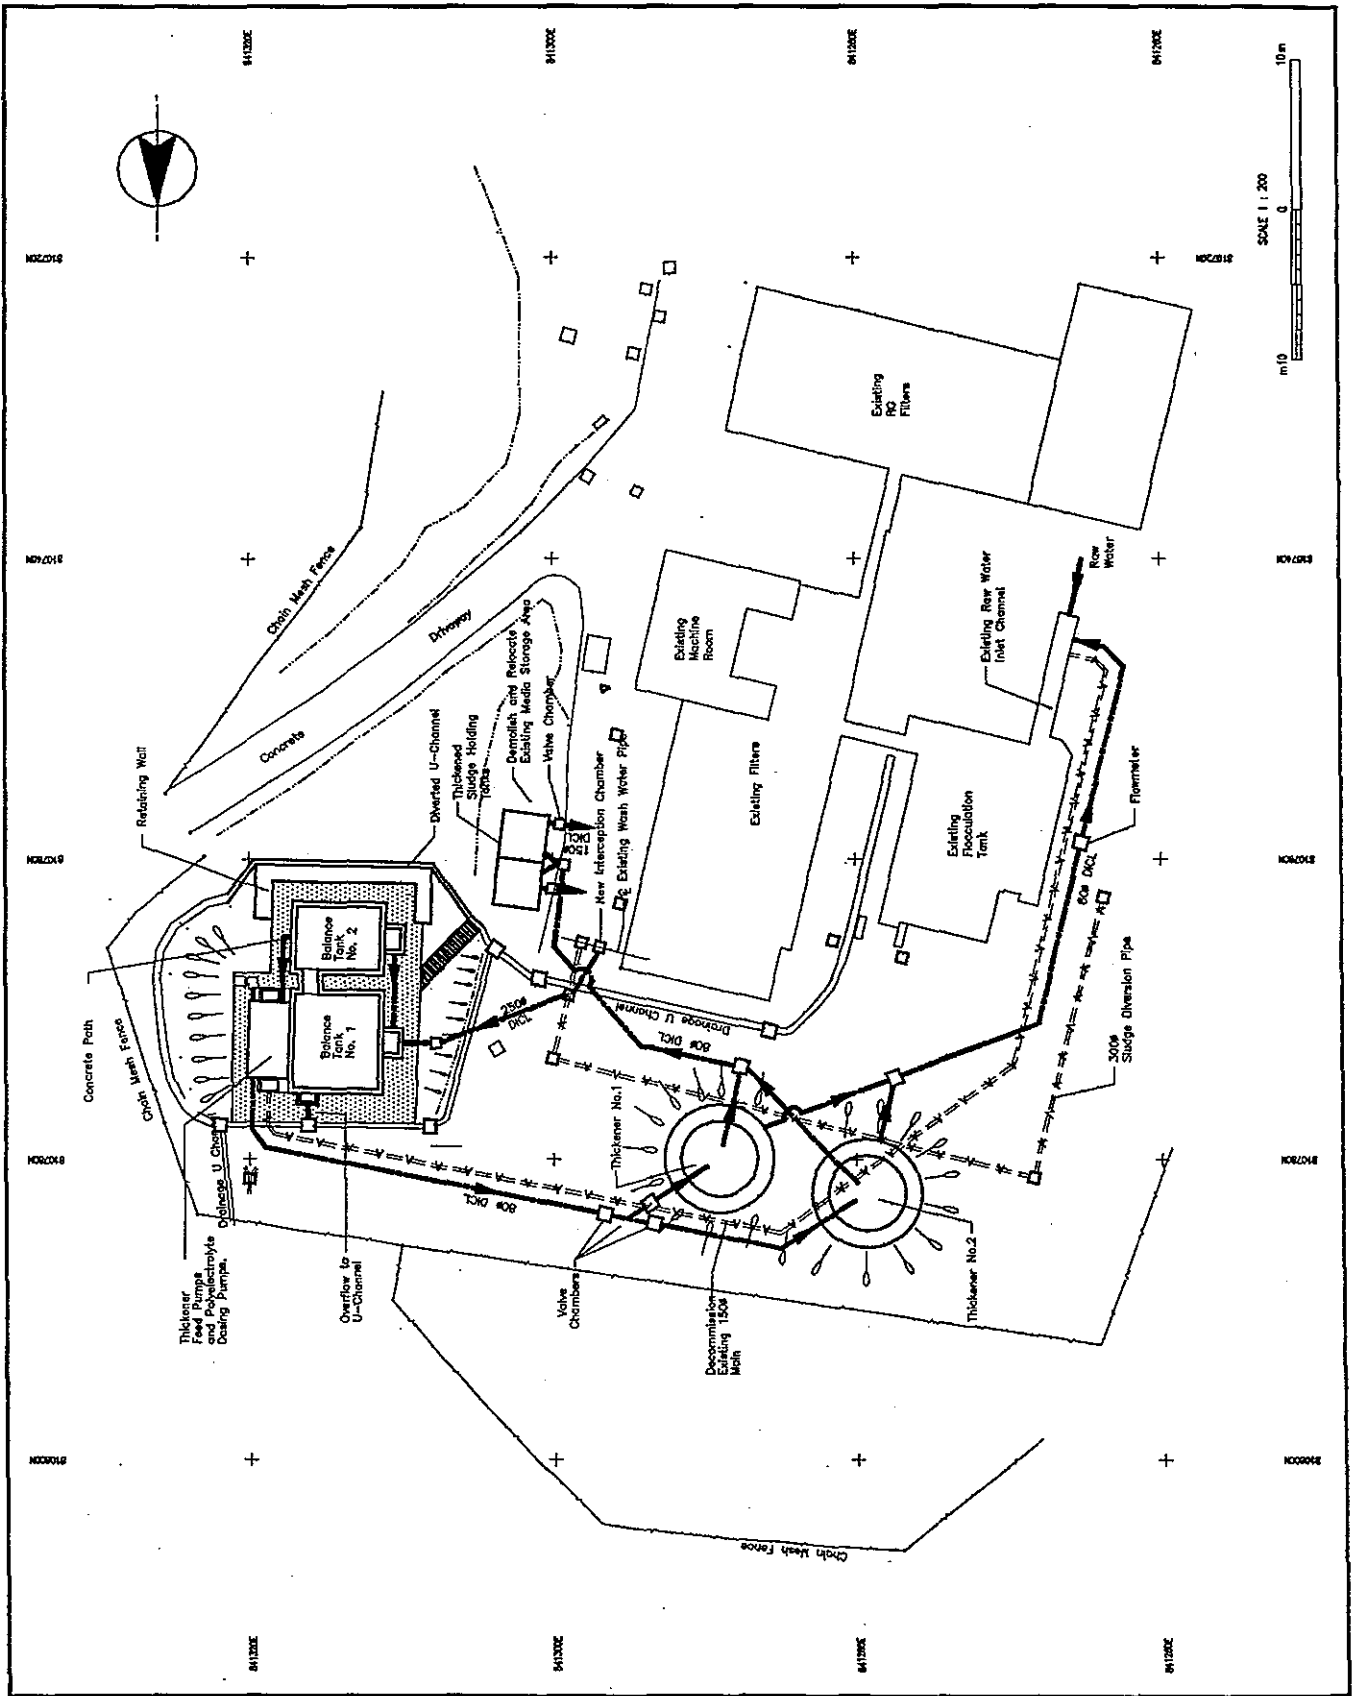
Layout of Proposed Sludge Treatment Facilities at Red Hill WTW
